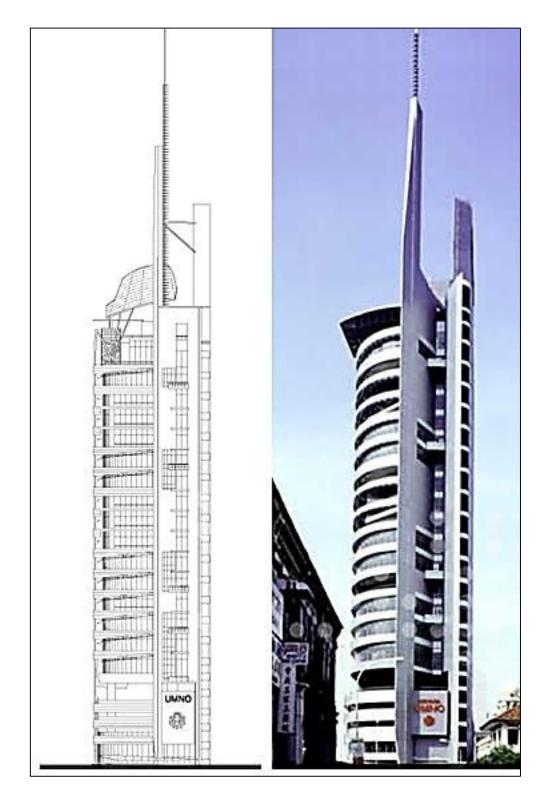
Menara UMNO Tower – view from the wing wall (south) facade (courtesy of TR Hamzah & Yeang Architects)
